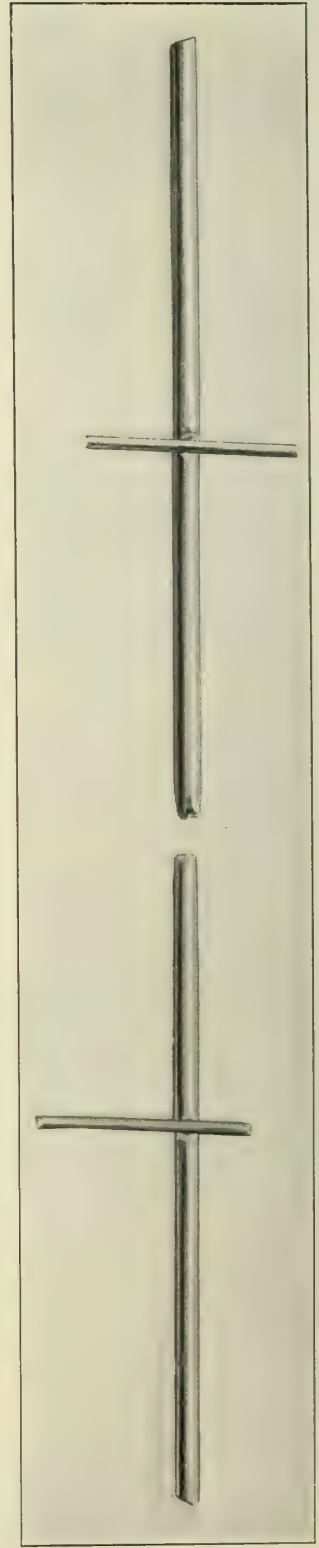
ELECTRICALLY WELDED FABRIC
